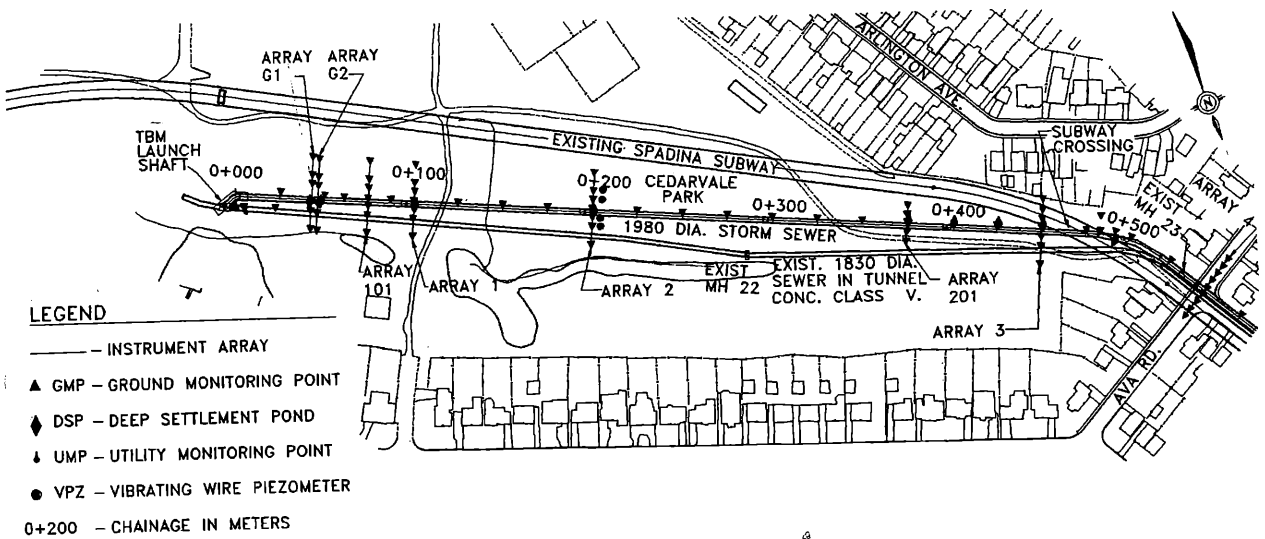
Plan Of Tunnel Monitoring In Cedarvale Park
